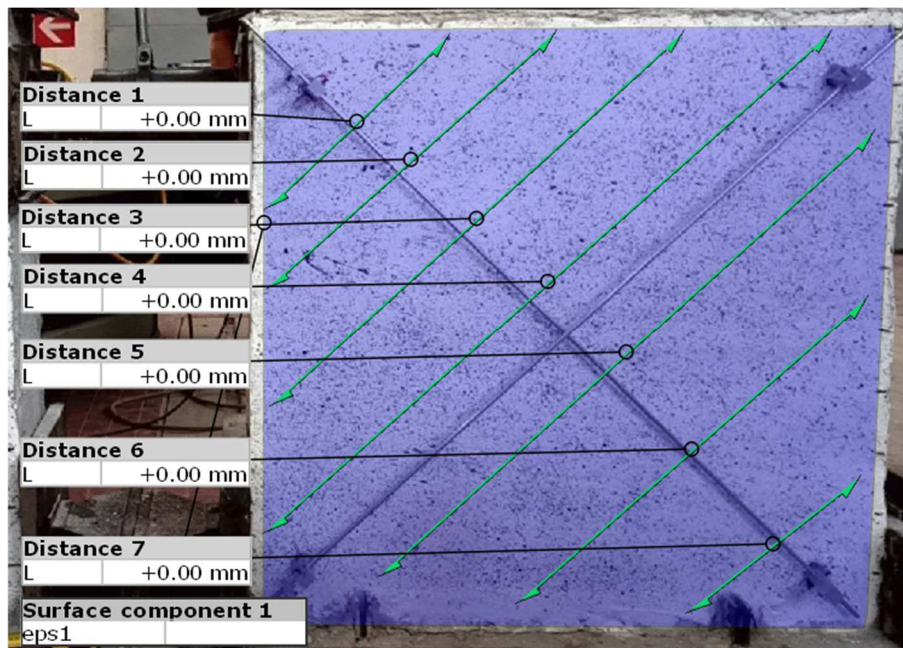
DIC analysis of the retrofitted masonry wall HBW5, before applying the horizontal load.
